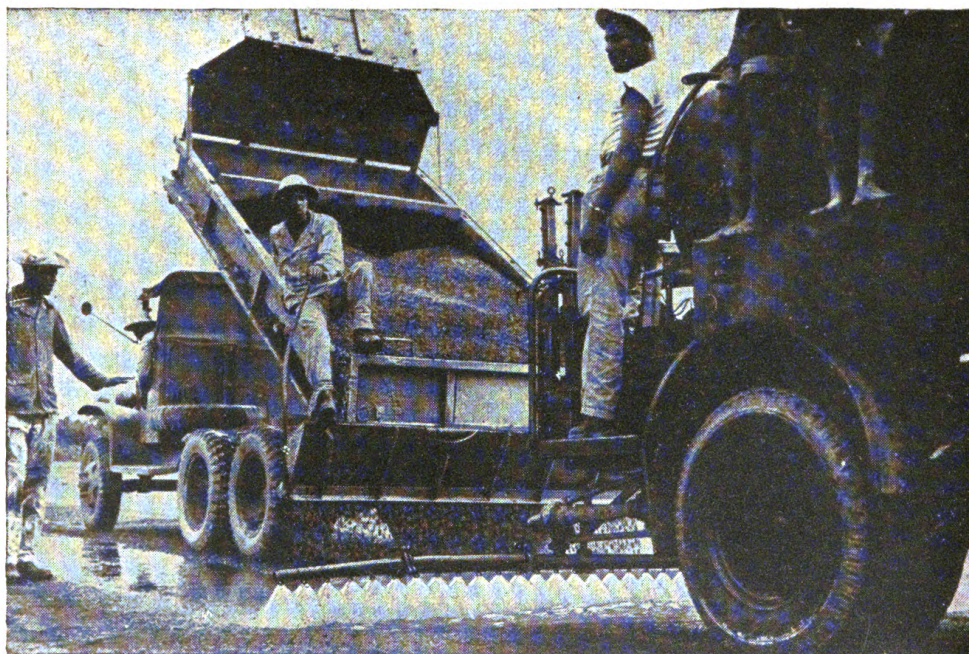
Trailer-mounted bituminous distributor spreading bitumen in surface treatment of a runway. Dump truck equipped with spreader is placing cover aggregate.
